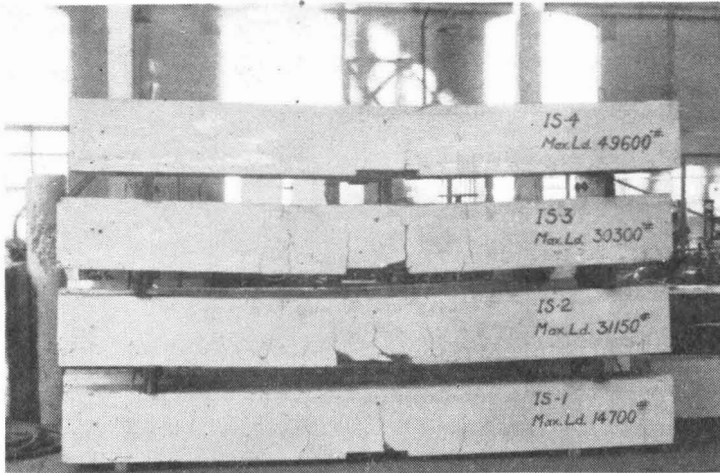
TYPICAL CONDITION AFTER ULTIMATE LOAD, OF BEAMS REINFORCED WITH "TWIN-TWISTED AND STRETCHED" BARS
